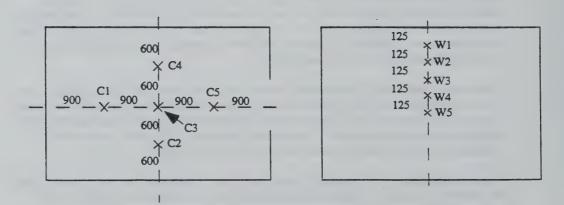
Positioning of thermocouples in the ceiling (left) and on the wall (right) (measures in mm).
